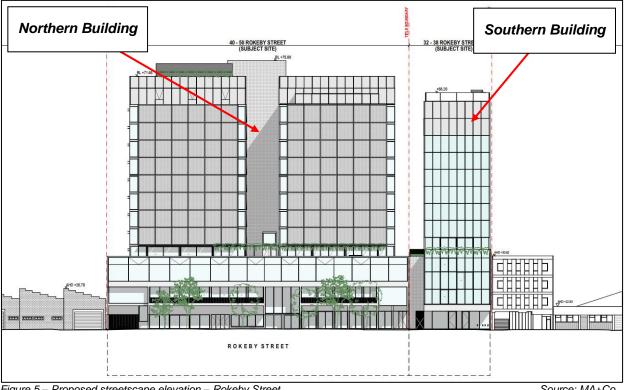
Proposed streetscape elevation – Rokeby Street.
